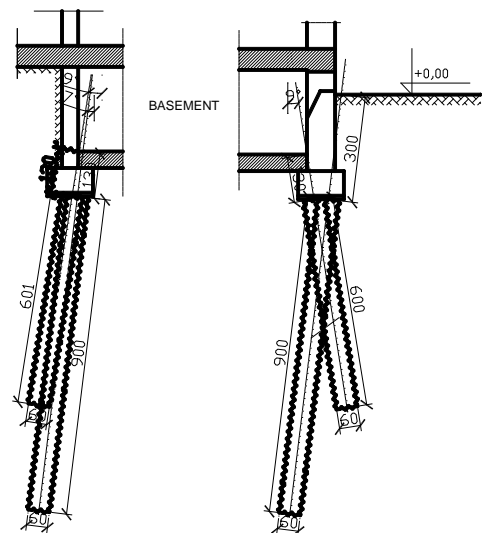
Typical cross sections of foundation with pile positioning and dimensions.
